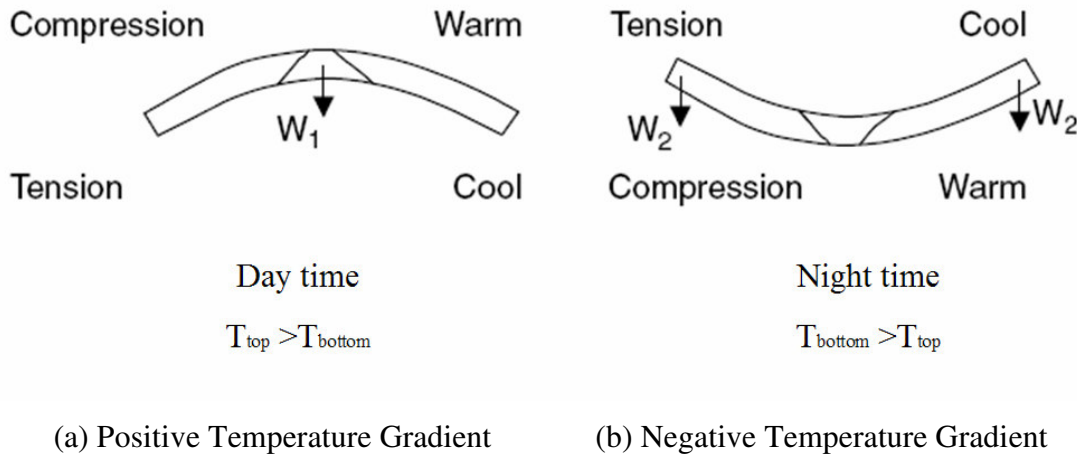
Diagram of Concrete Slab Curling (Fwa 2006)
